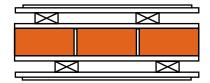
NCC Deemed-to-Satisfy Wall Systems for NT: Single leaf brickwork, 80mm clay bricks
